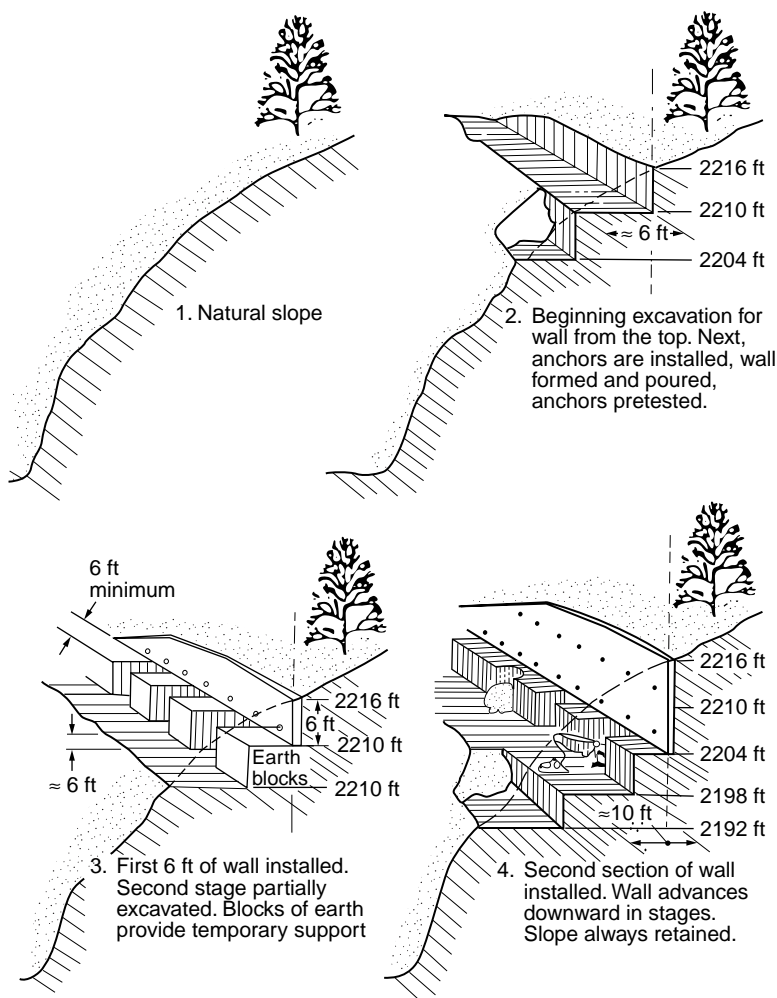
The “Brazilian method” of construction of an anchored curtain wall from the top down. (Source: Hunt, R. E., and da Costa Nunes, A. J. 1978. Retaining walls: Taking it from the top. *Civ. Eng.*, ASCE, May, 73–75.)
